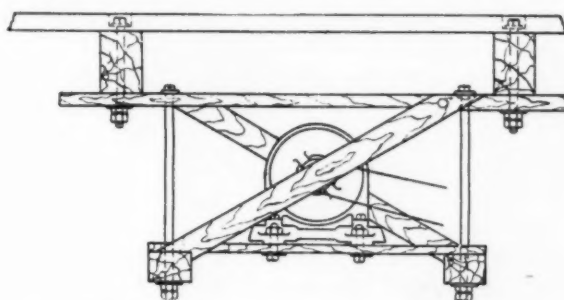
Supporting Motor from Ceiling Joists with Motor in Horizontal Position
